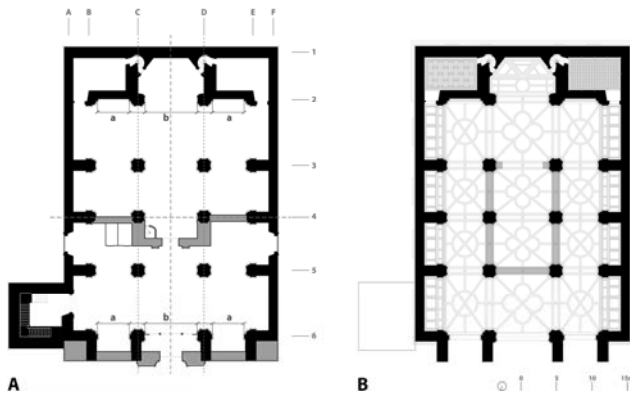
(a) Current floor plan with pillar axes and symmetry axes. Provisional or non-original elements are shown in gray. (b) Reconstructed floor plan of the original project. Possible choir shown in gray. Author's own.
